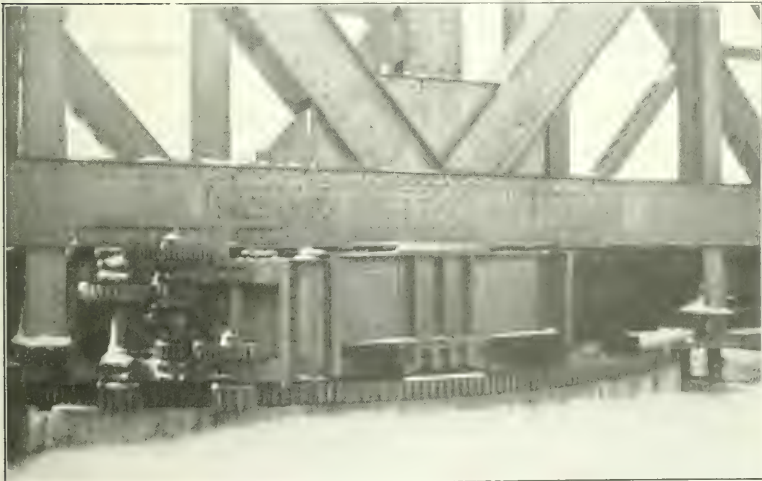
CONNEAUT DRAW SPAN. CENTER CARRYING GIRDERS, AND RACK AND PINIONS.
